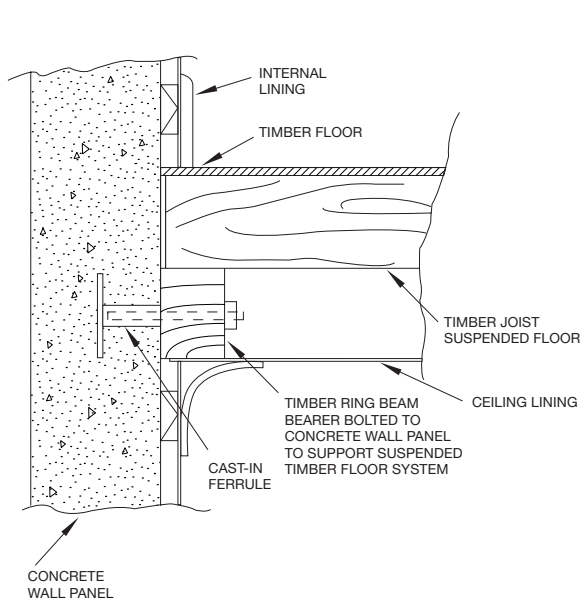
Panel to Suspended Timber-Framed Floor Connection. (Timber floor supported by wall panel via timber ring beam)
